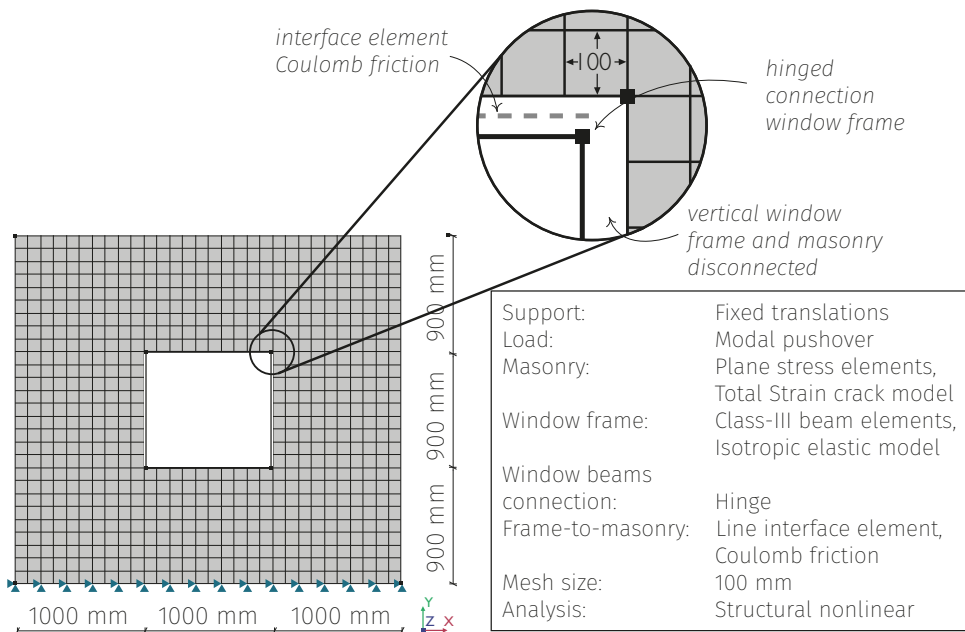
Overview of the numerical model of the unconfined masonry wall with window opening.
